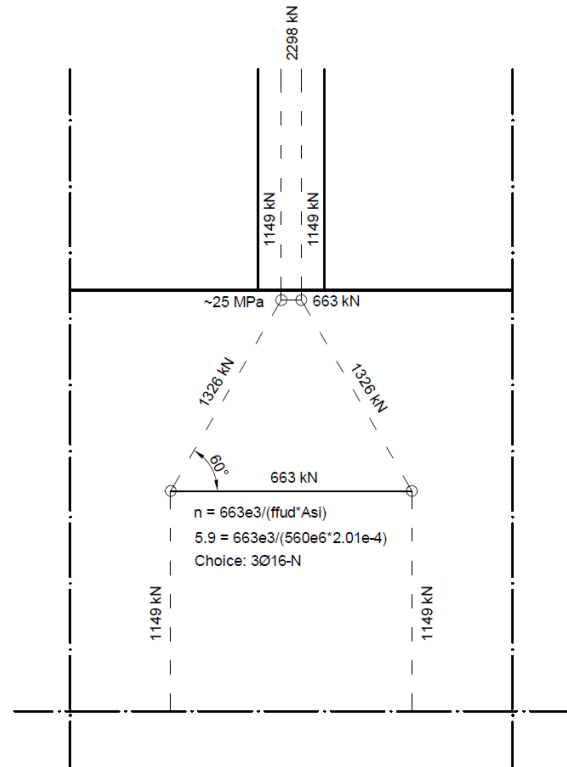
Strut and tie model for design of BFRP splitting reinforcement.
